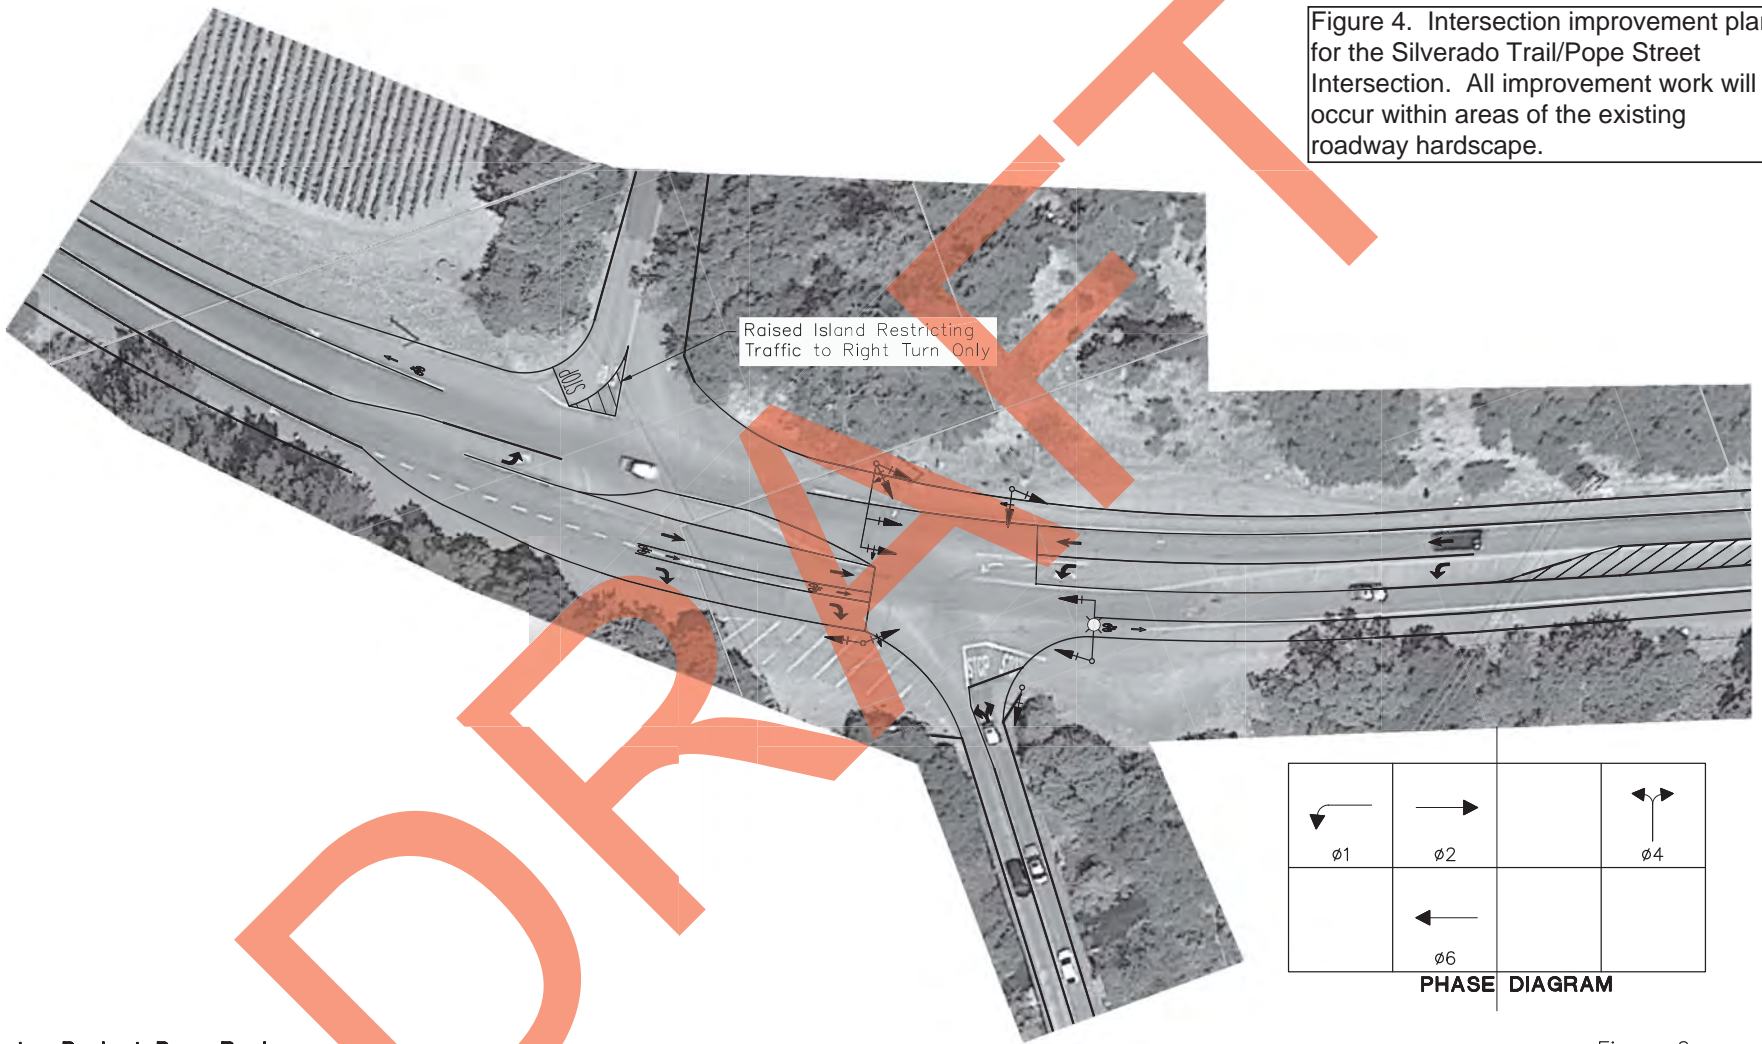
Intersection improvement plan for the Silverado Trail/Pope Street Intersection. All improvement work will occur within areas of the existing roadway hardscape.
